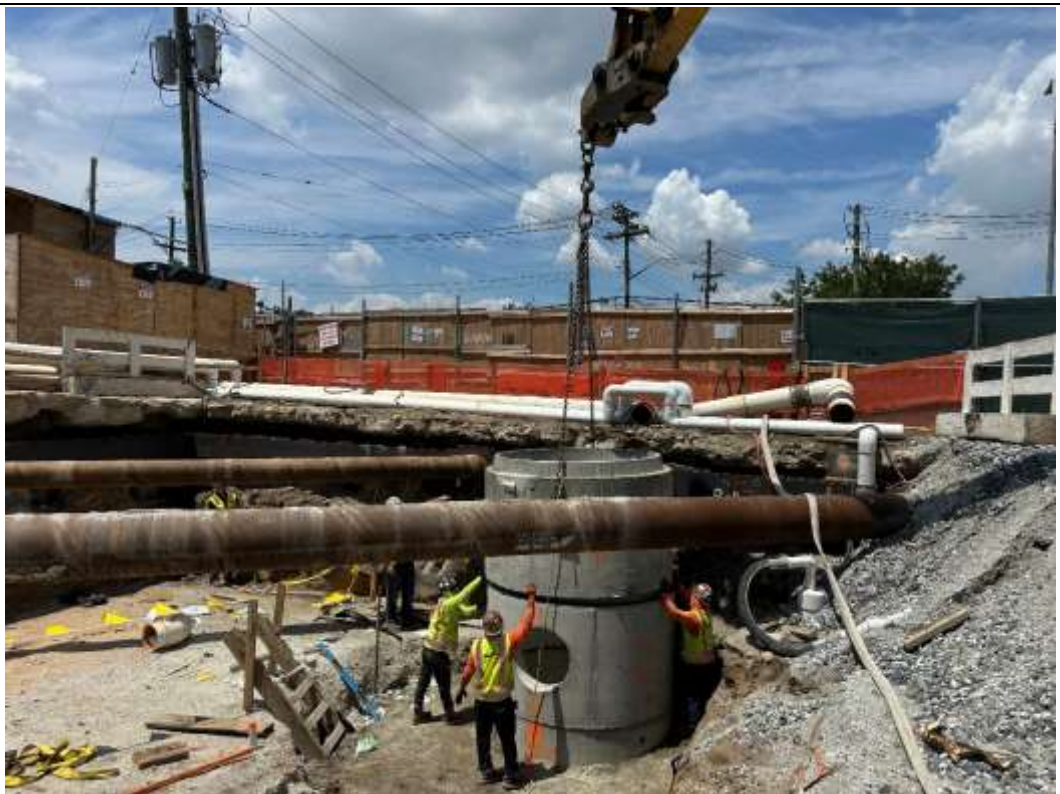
ADG installing a dewatering well in the eastern portion the Site, facing east.
